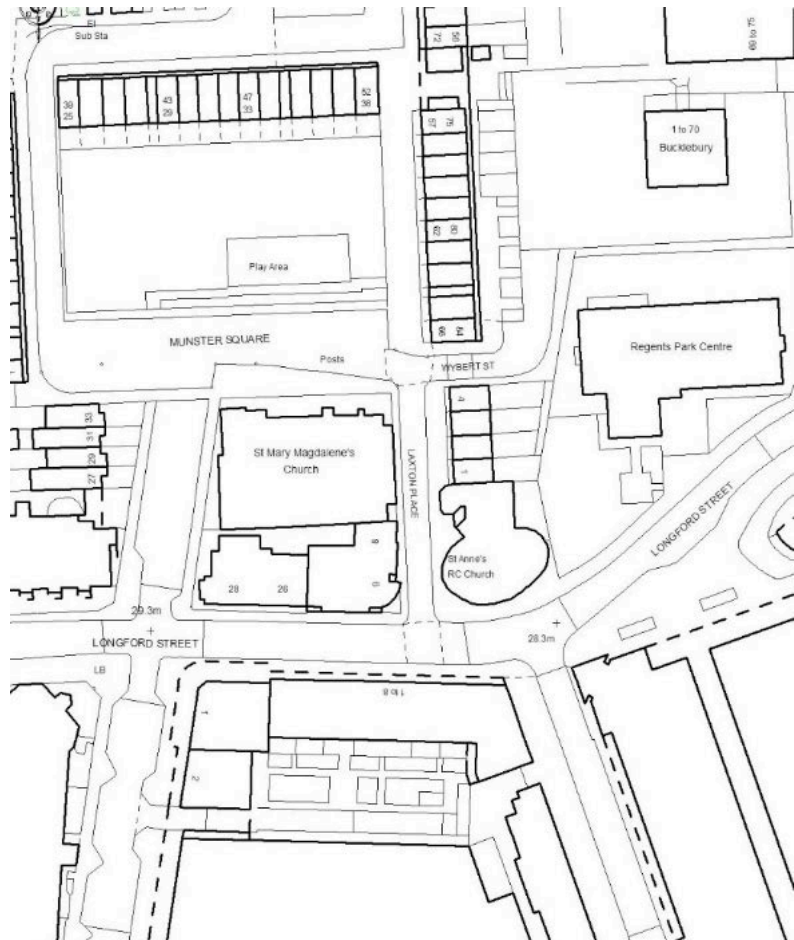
Site plan showing St Anne's Church and the immediate surroundings
